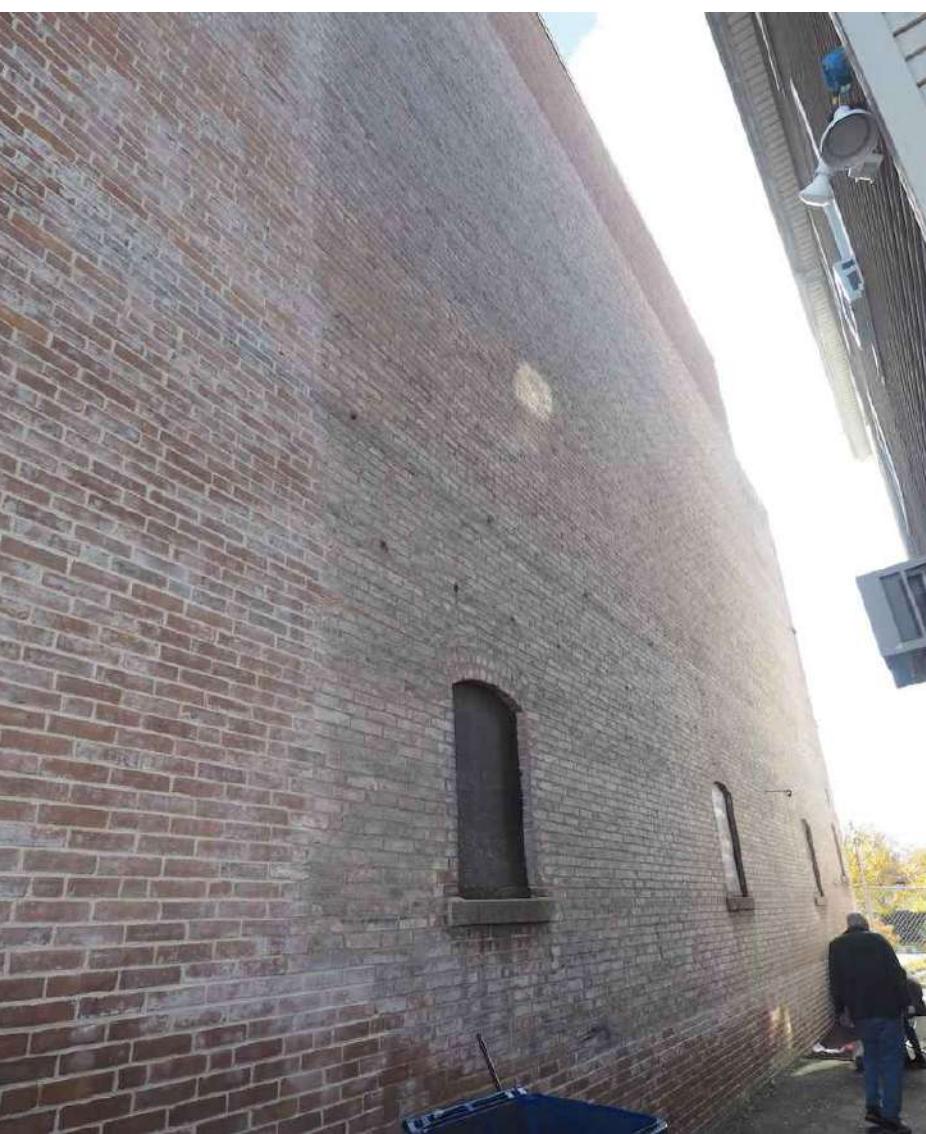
NOTE 2 & NOTE 9 WINDOWS
